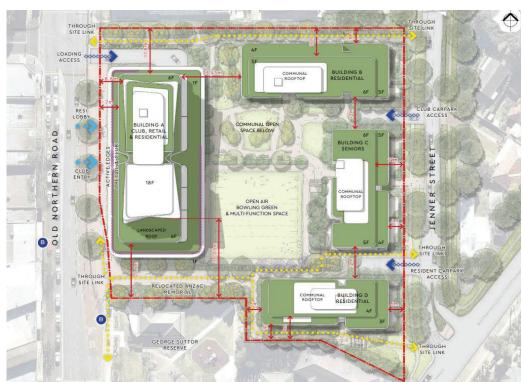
Concept master plan showing indicative site layout (Source: Altis)
